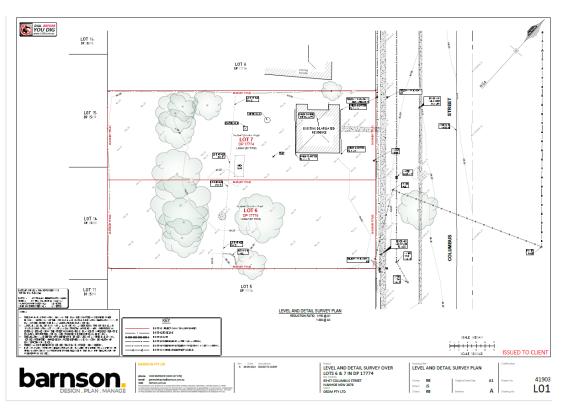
Survey Plan. Source: Barnson Pty Ltd
